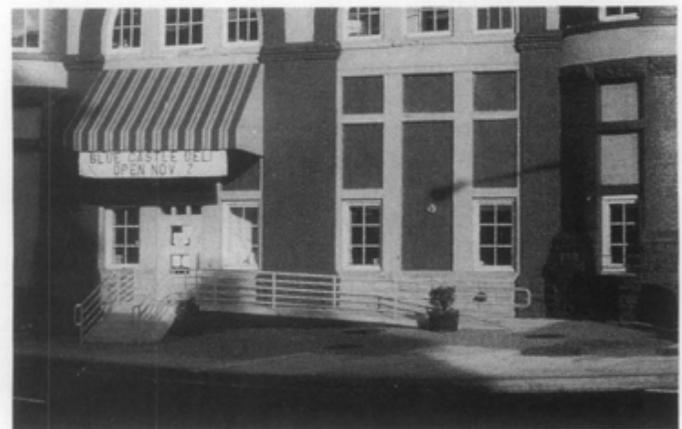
Simple, contemporary railings that extend beyond the ramp slope make this ramp compatible with the industrial character of this building. Photo: Thomas Jester.
